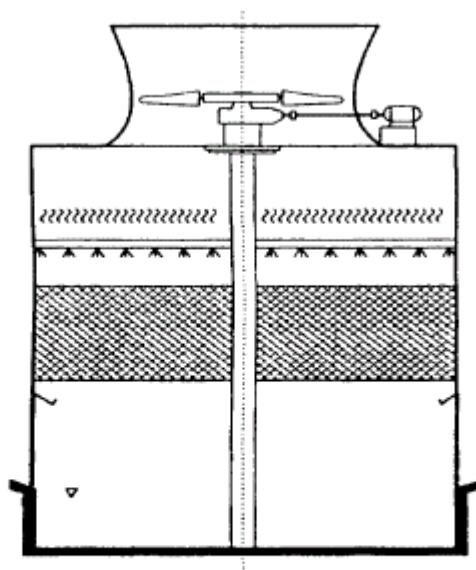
Mechanical draught cooling tower (suction fans, cell construction)
